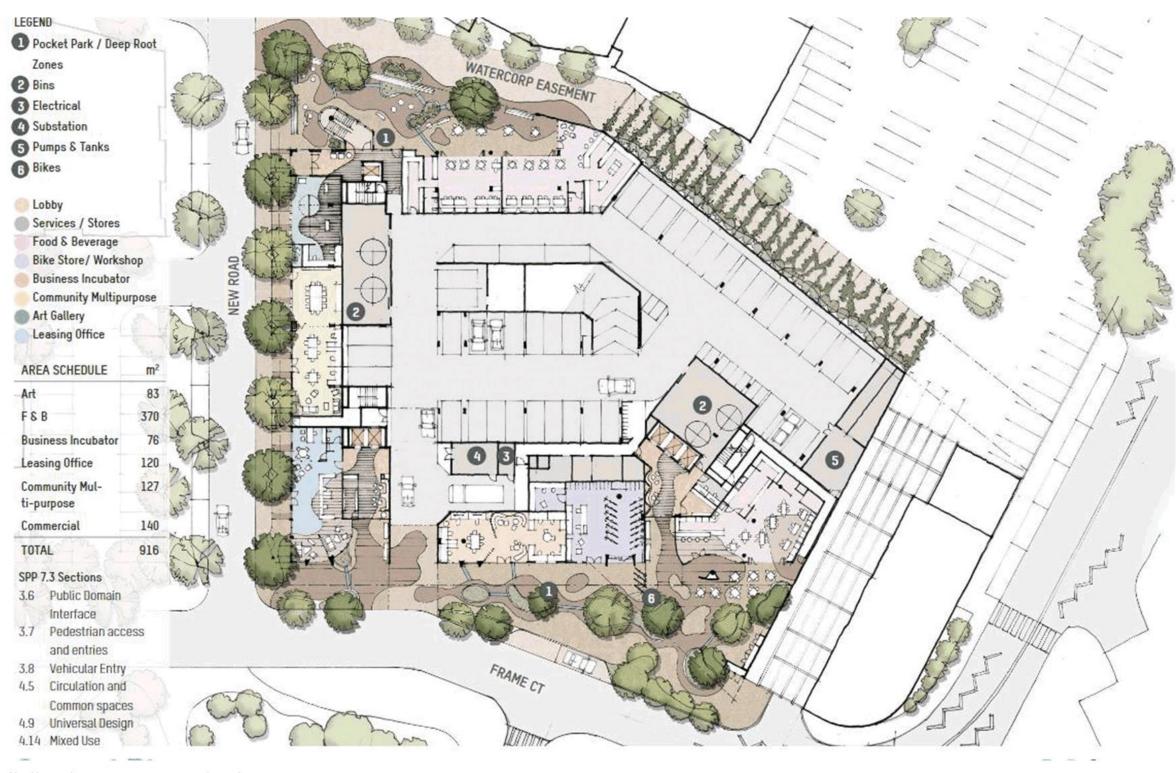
Ground level layout plan – 40 Frame Court LDP as submitted
